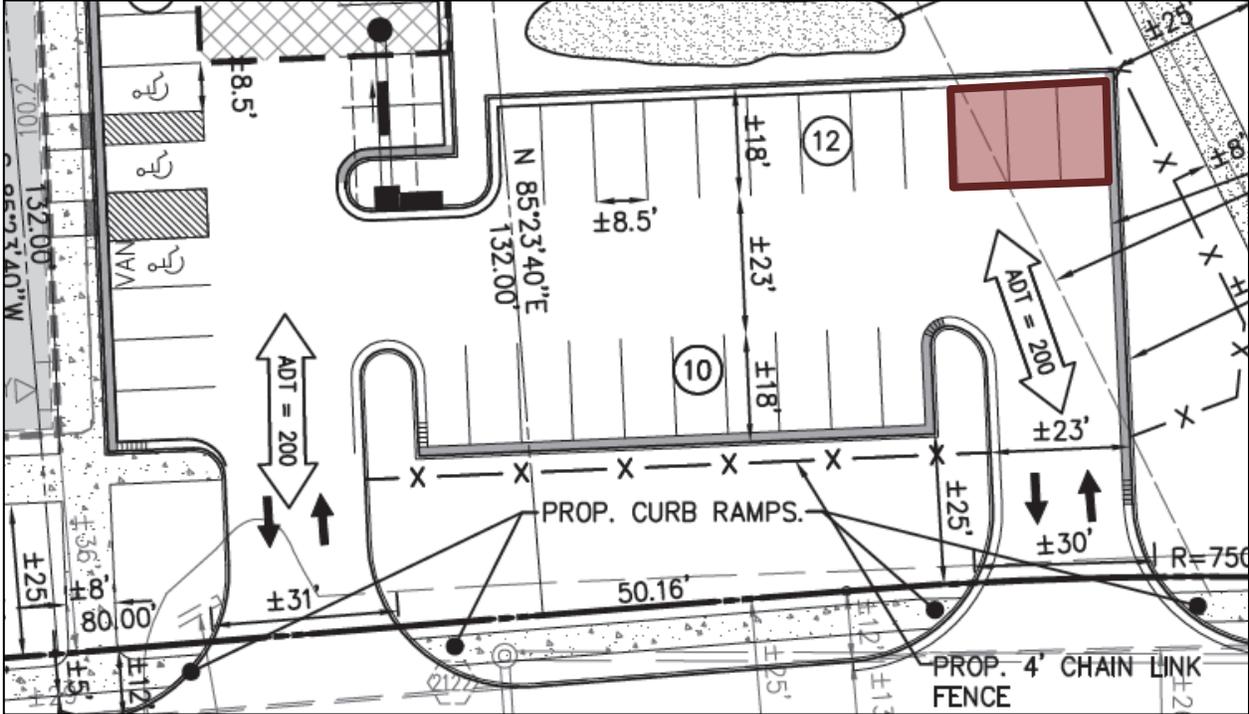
Staff is concerned that the shaded parking spaces would pose conflicts with motorists entering the site. These spaces should be designated for employee parking (Source - Walter Phillips, Inc. – November 19, 2013)
